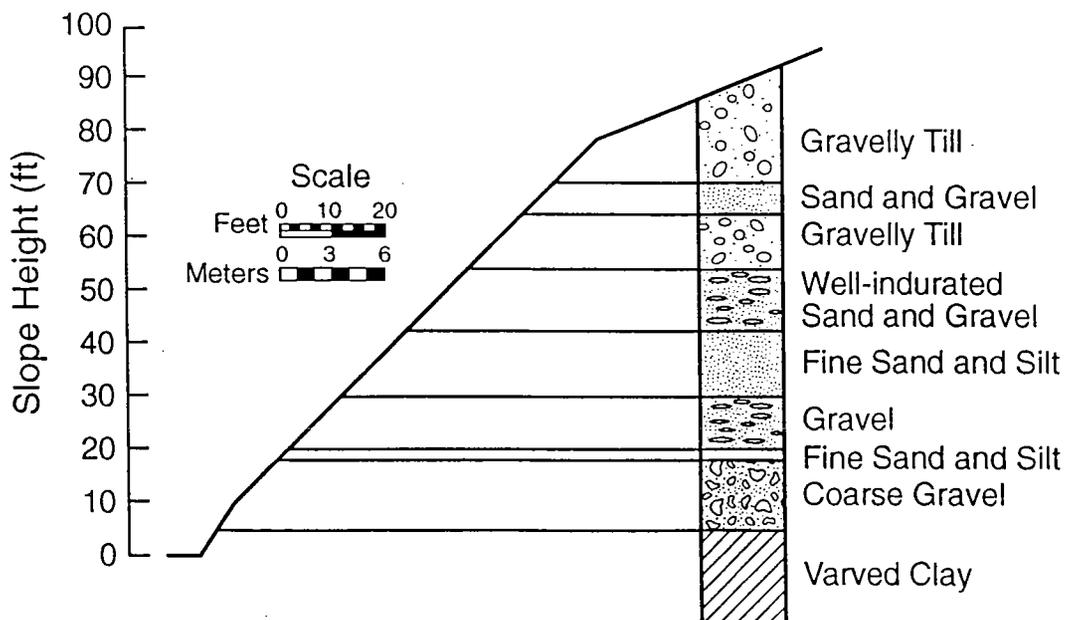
Slope geometry and soil profile at the Clough Pike site.
